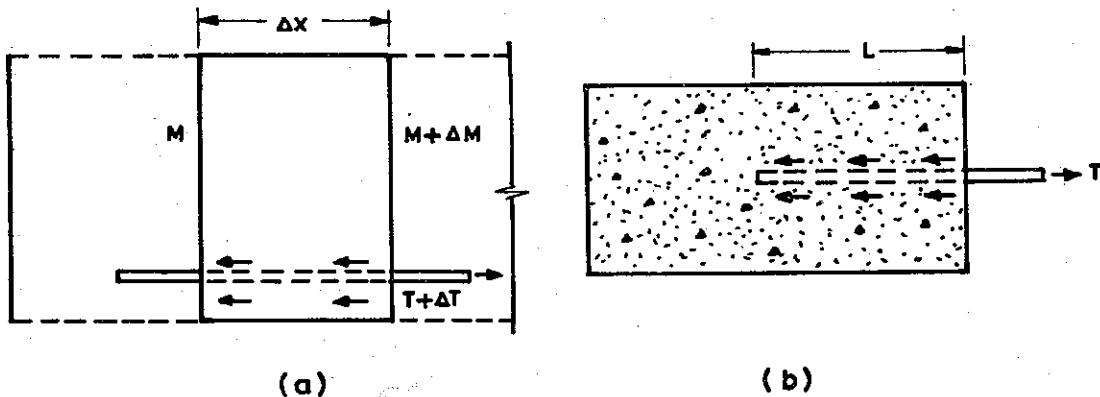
Bond stresses: (a) Local (flexural) ; (b) Anchorage (average).
